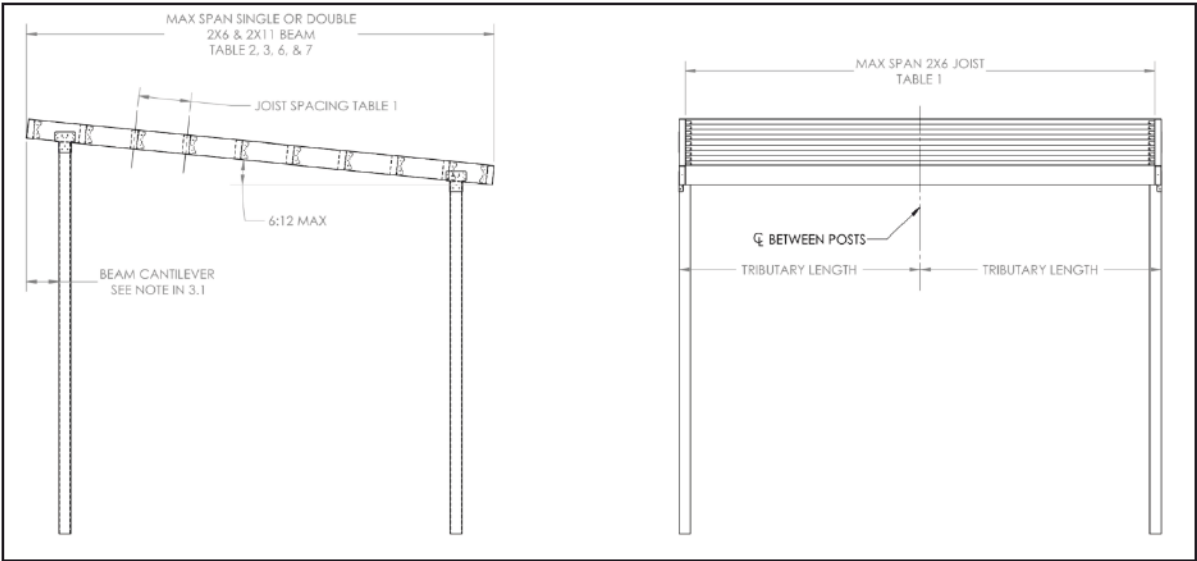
Joist Rafters Parallel to House Freestanding Diagram
